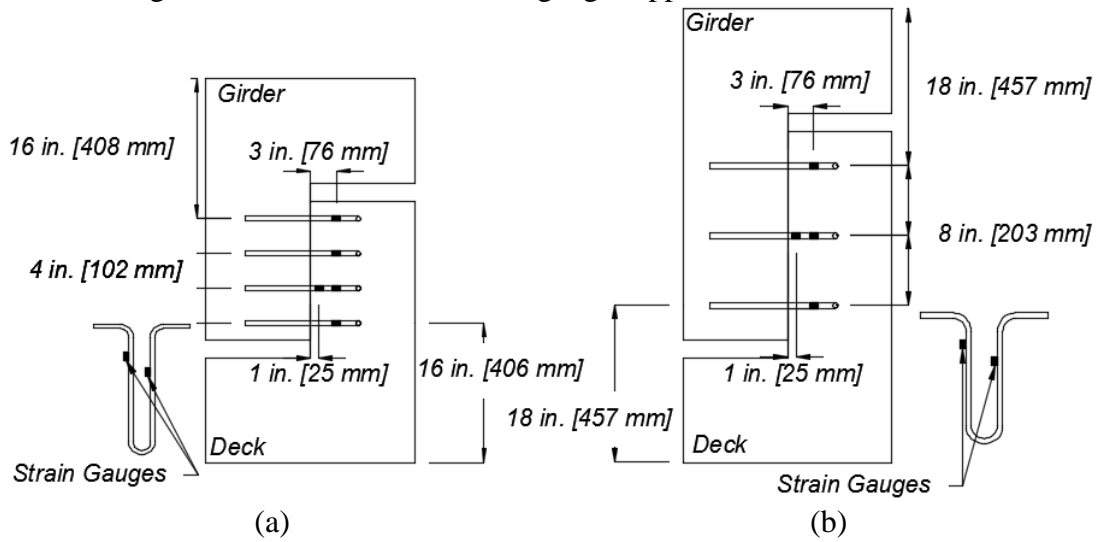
Internal instrumentation elevation: (a) Specimens containing #4 [#13M] reinforcing bars across the interface and (b) specimens containing #5 [#16M] reinforcing bars across the interface.
